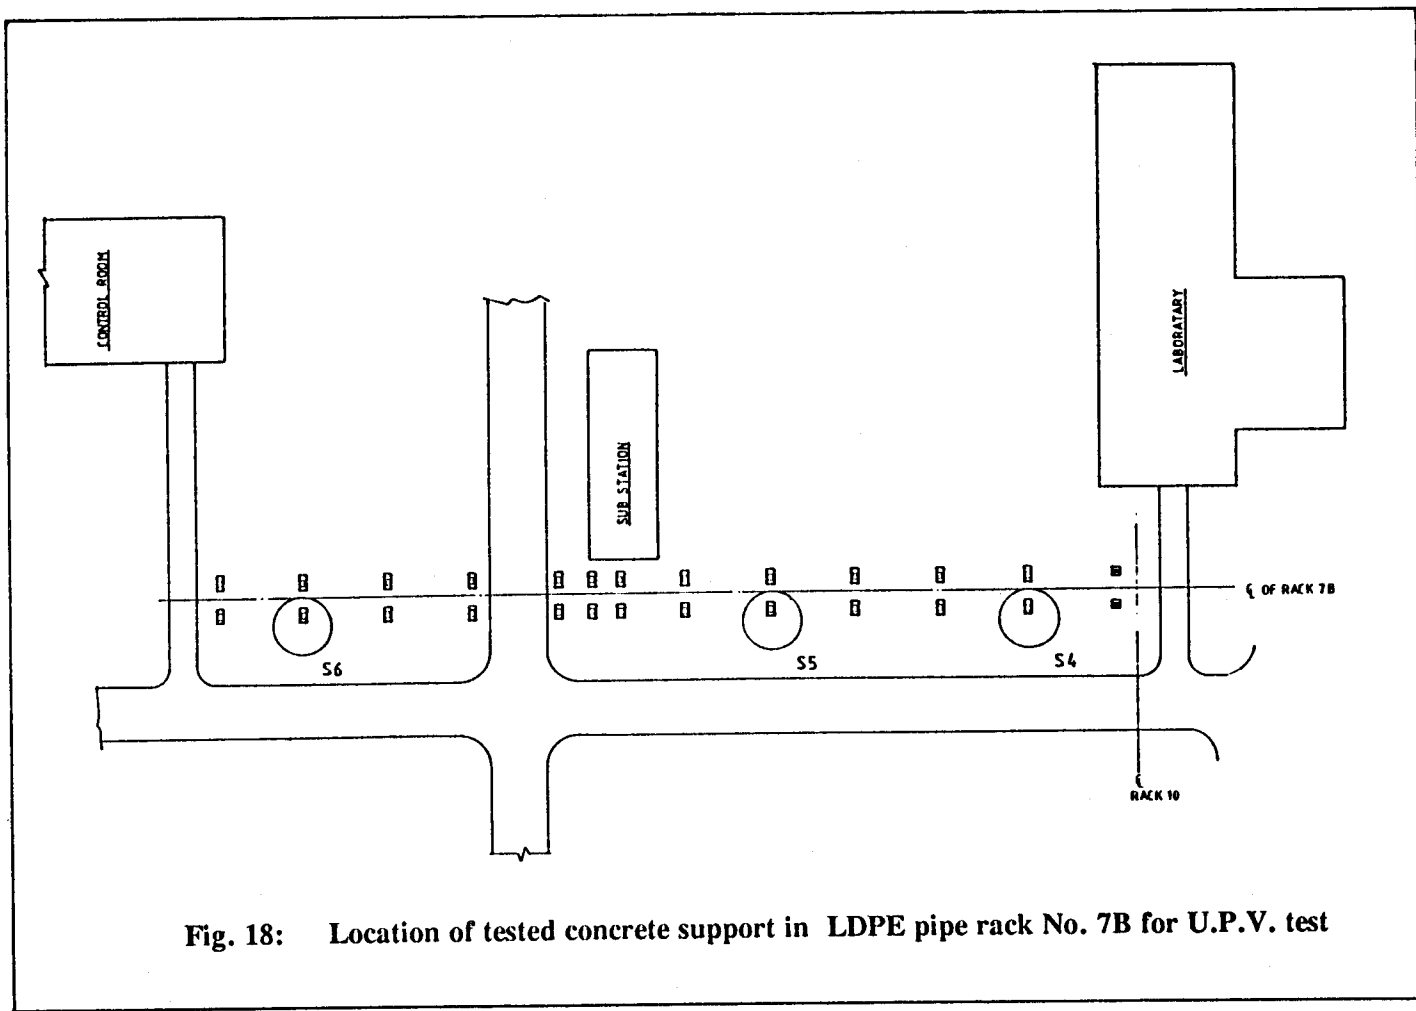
Location of tested concrete support in LDPE pipe rack No. 7B for U.P.V. test
